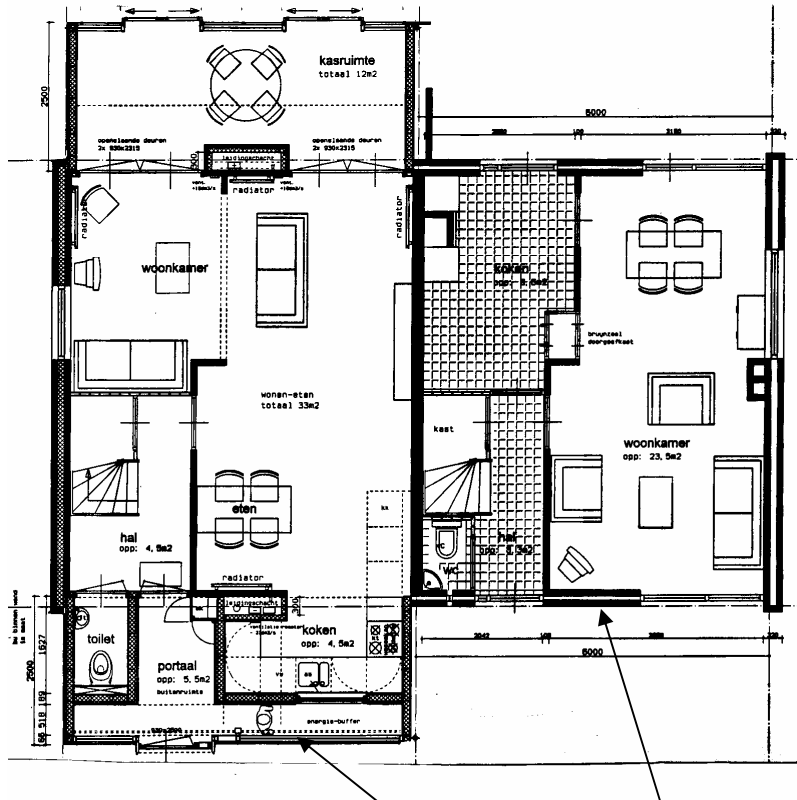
The ground floor plan under the glass skin (left) and in the existing situation (right)
